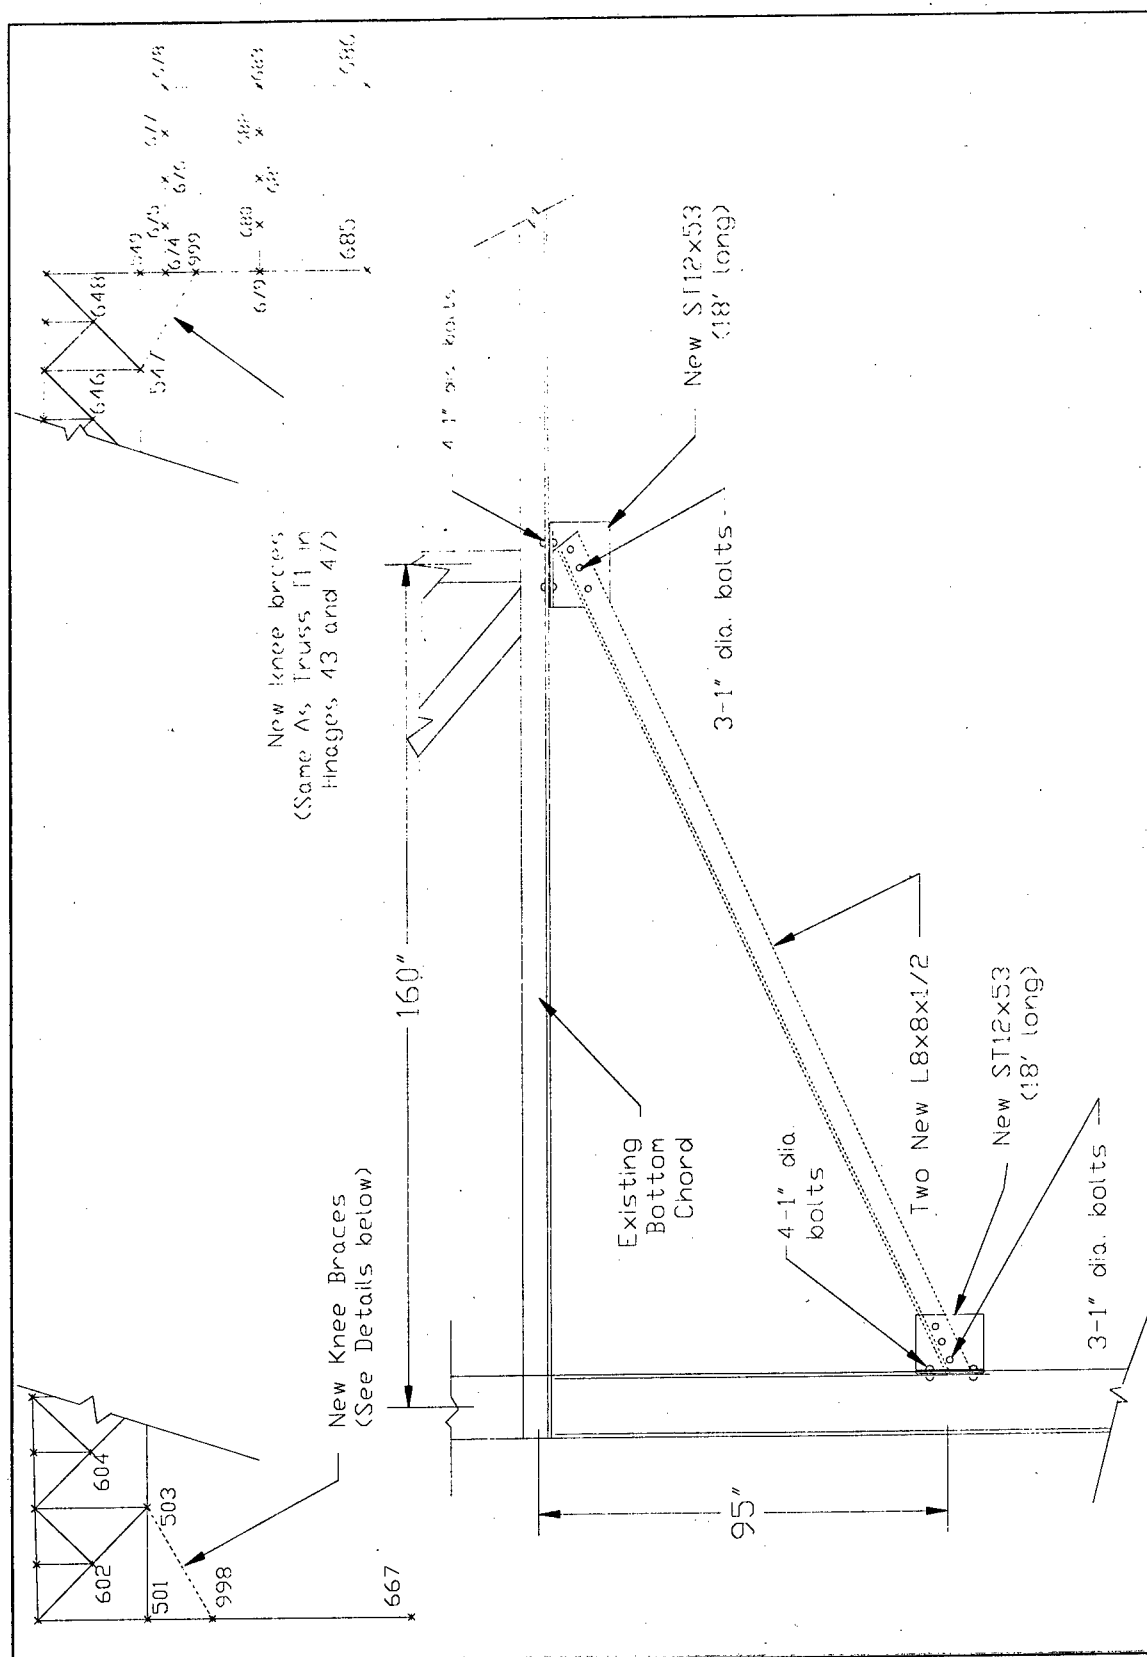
CCAD, TX, new knee braces for Truss T1, Hangars 43 and 47.
